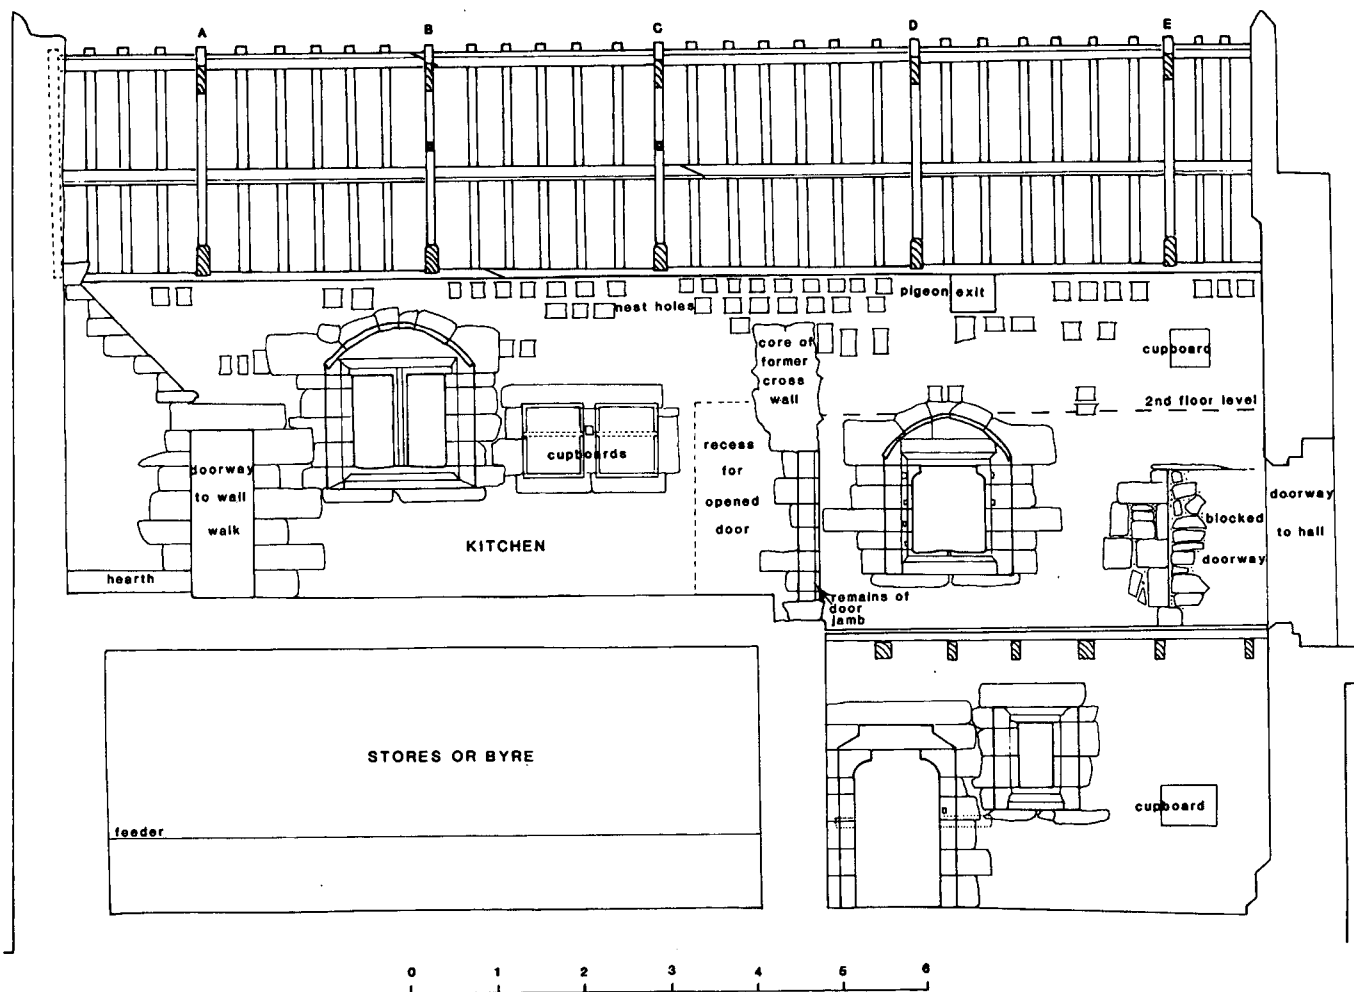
Existing internal elevation of east wall of kitchen range and roof frame as originally built.
